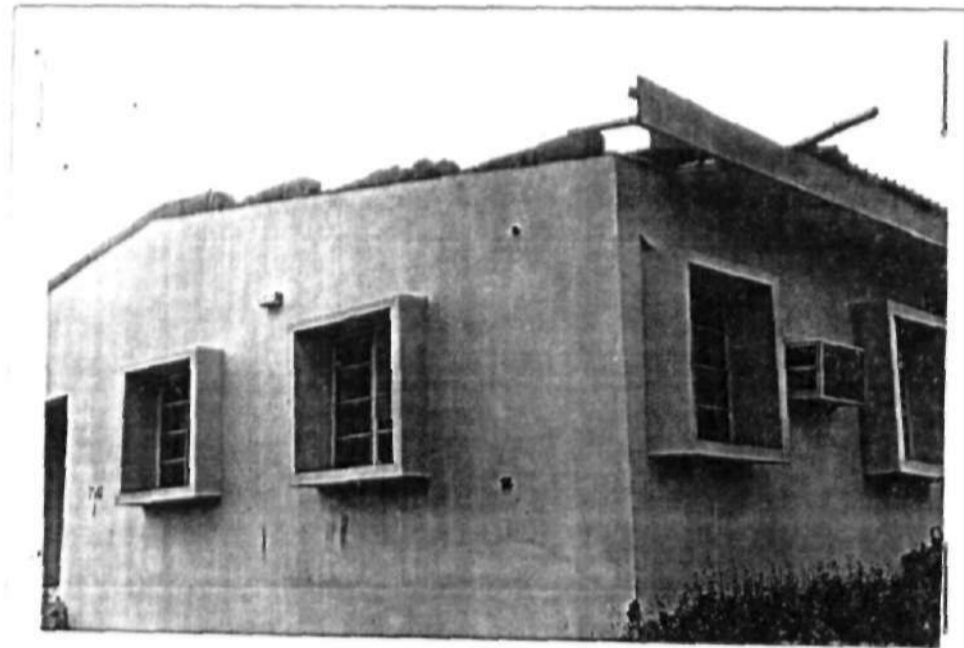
Rafter, purlins and roofing sheets blown - off from wall due to non provision of roof beam
